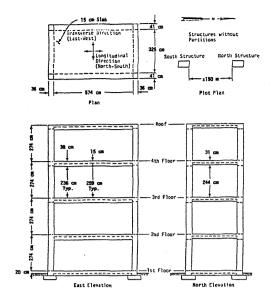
4-STORY CONCRETE TEST STRUCTURES
